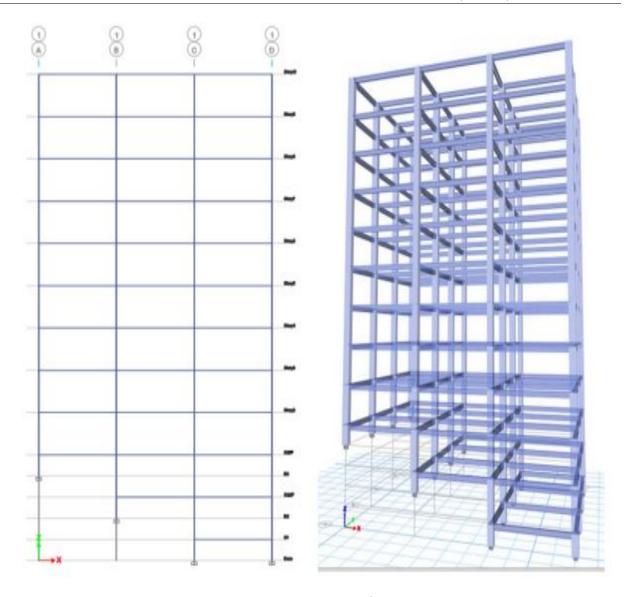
Front elevation and 3D view of 27⁰ model with fixed base
